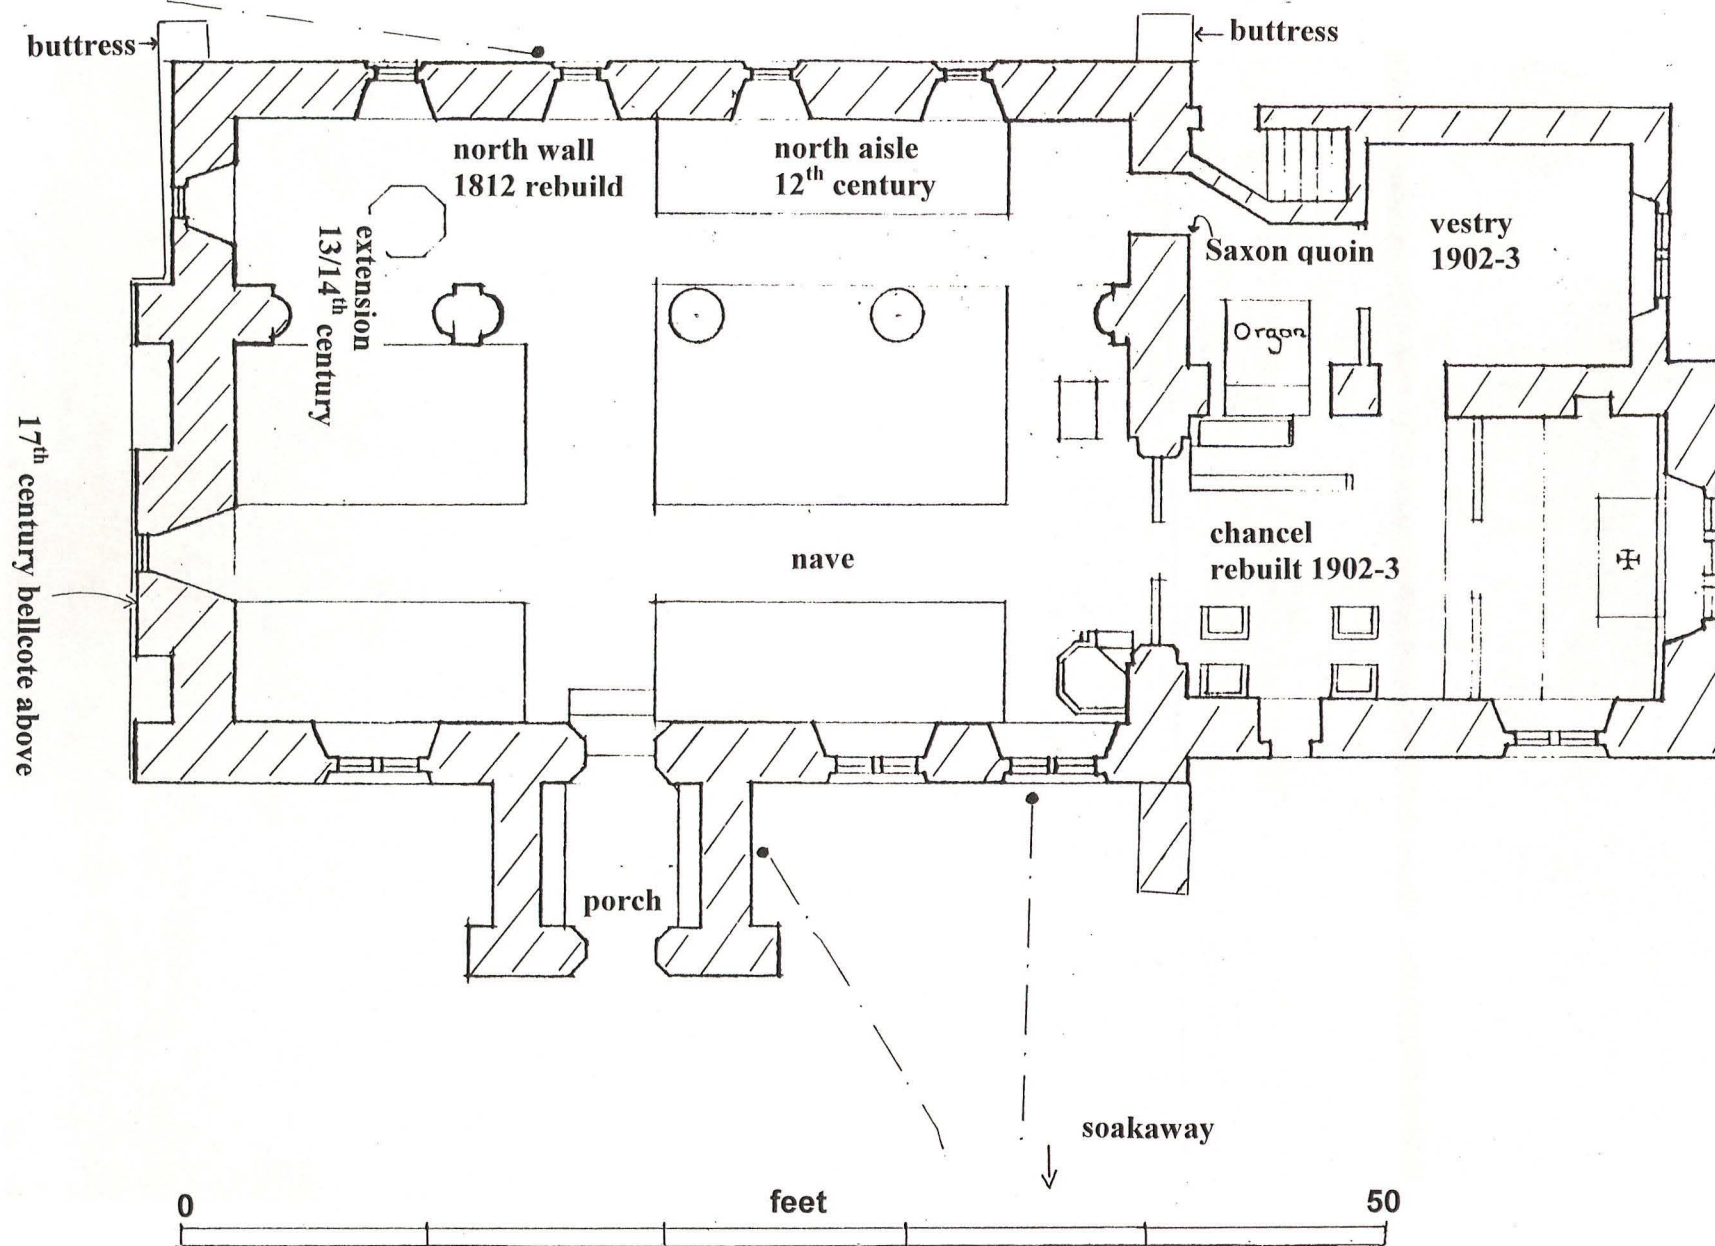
Cranwell church plan based on plan supplied by the architect.
